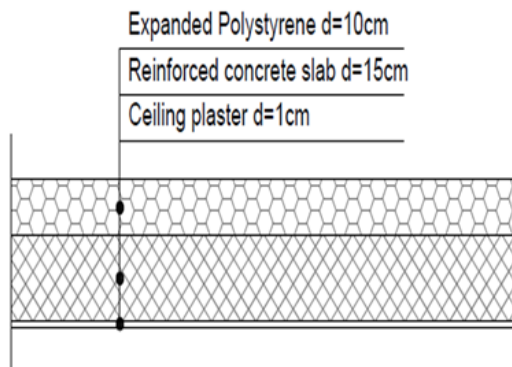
Cross-section of the intermediate floor structure above the second floor (attic slab)
